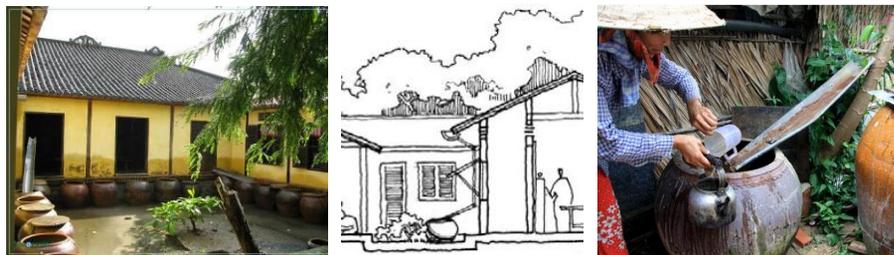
Rainwater harvesting system in V6 & V7 cases and typical rural houses¹⁶⁶
